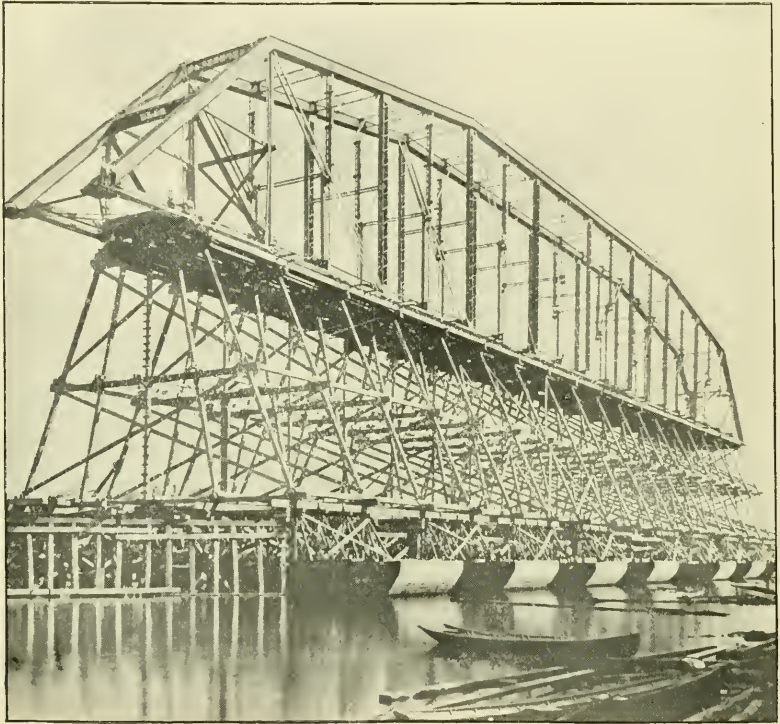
OHIO CONNECTING RAILWAY BRIDGE.
